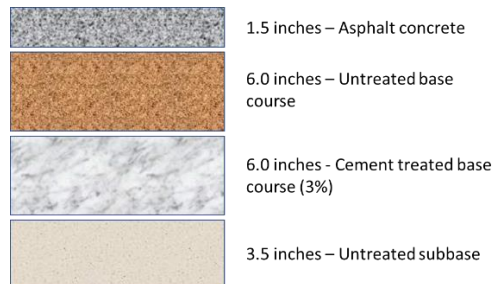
Section H inverted pavement from I-010-1(8) [Johnson 1961].
